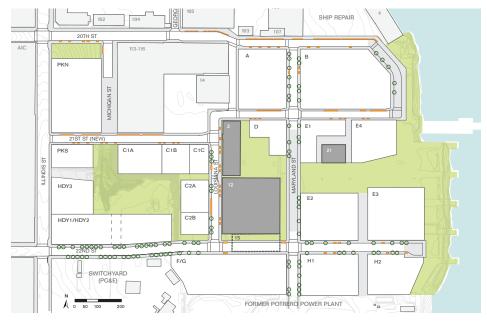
Illustrative Street Trees and Planting Concept Plan
